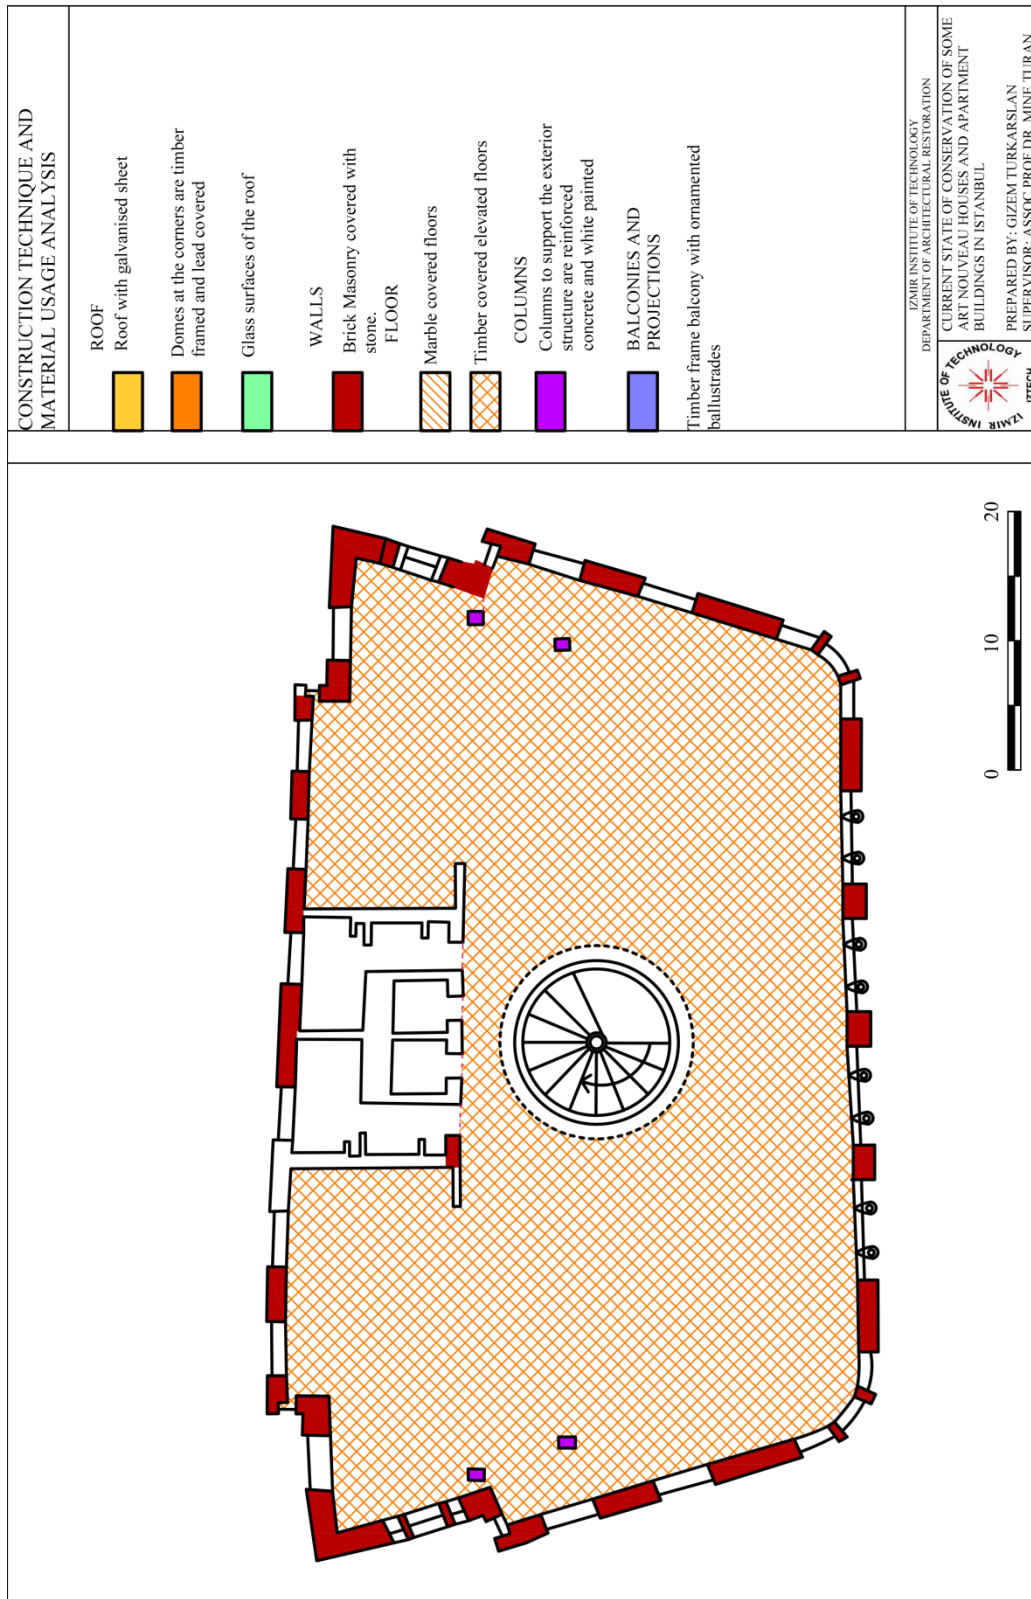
First Floor Plan, Construction Technique and Material Usage Analysis of Frej Apartment Building
